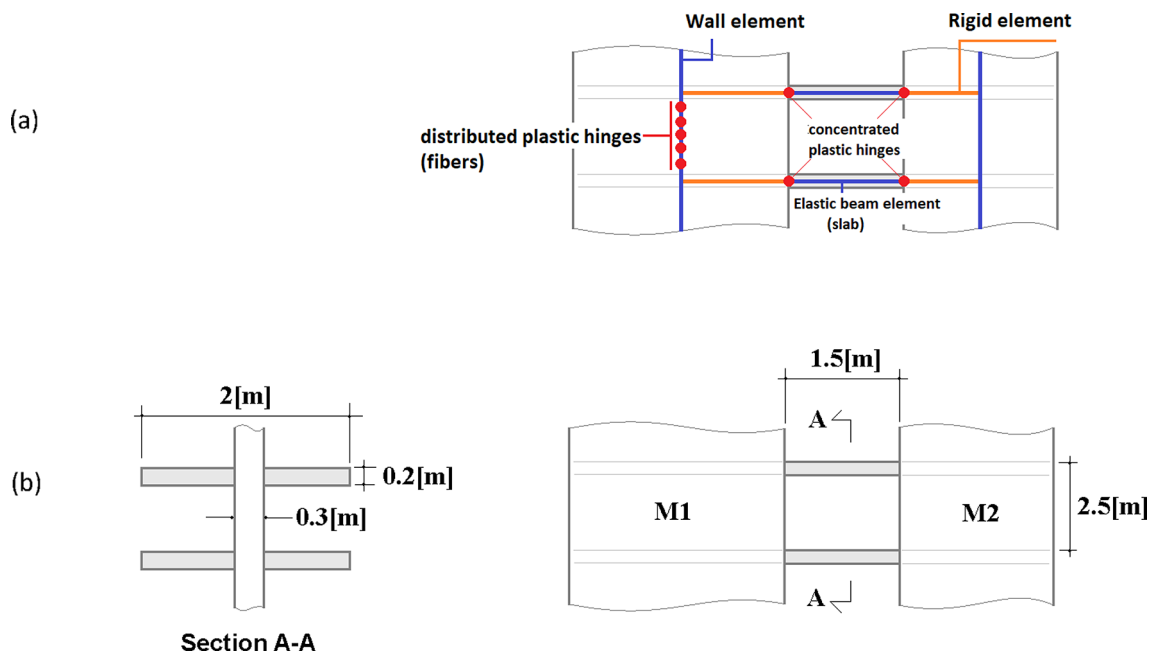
(a) Beam-column equivalent model for the 2D parametric study, and (b) interstory wall and slab scheme.
